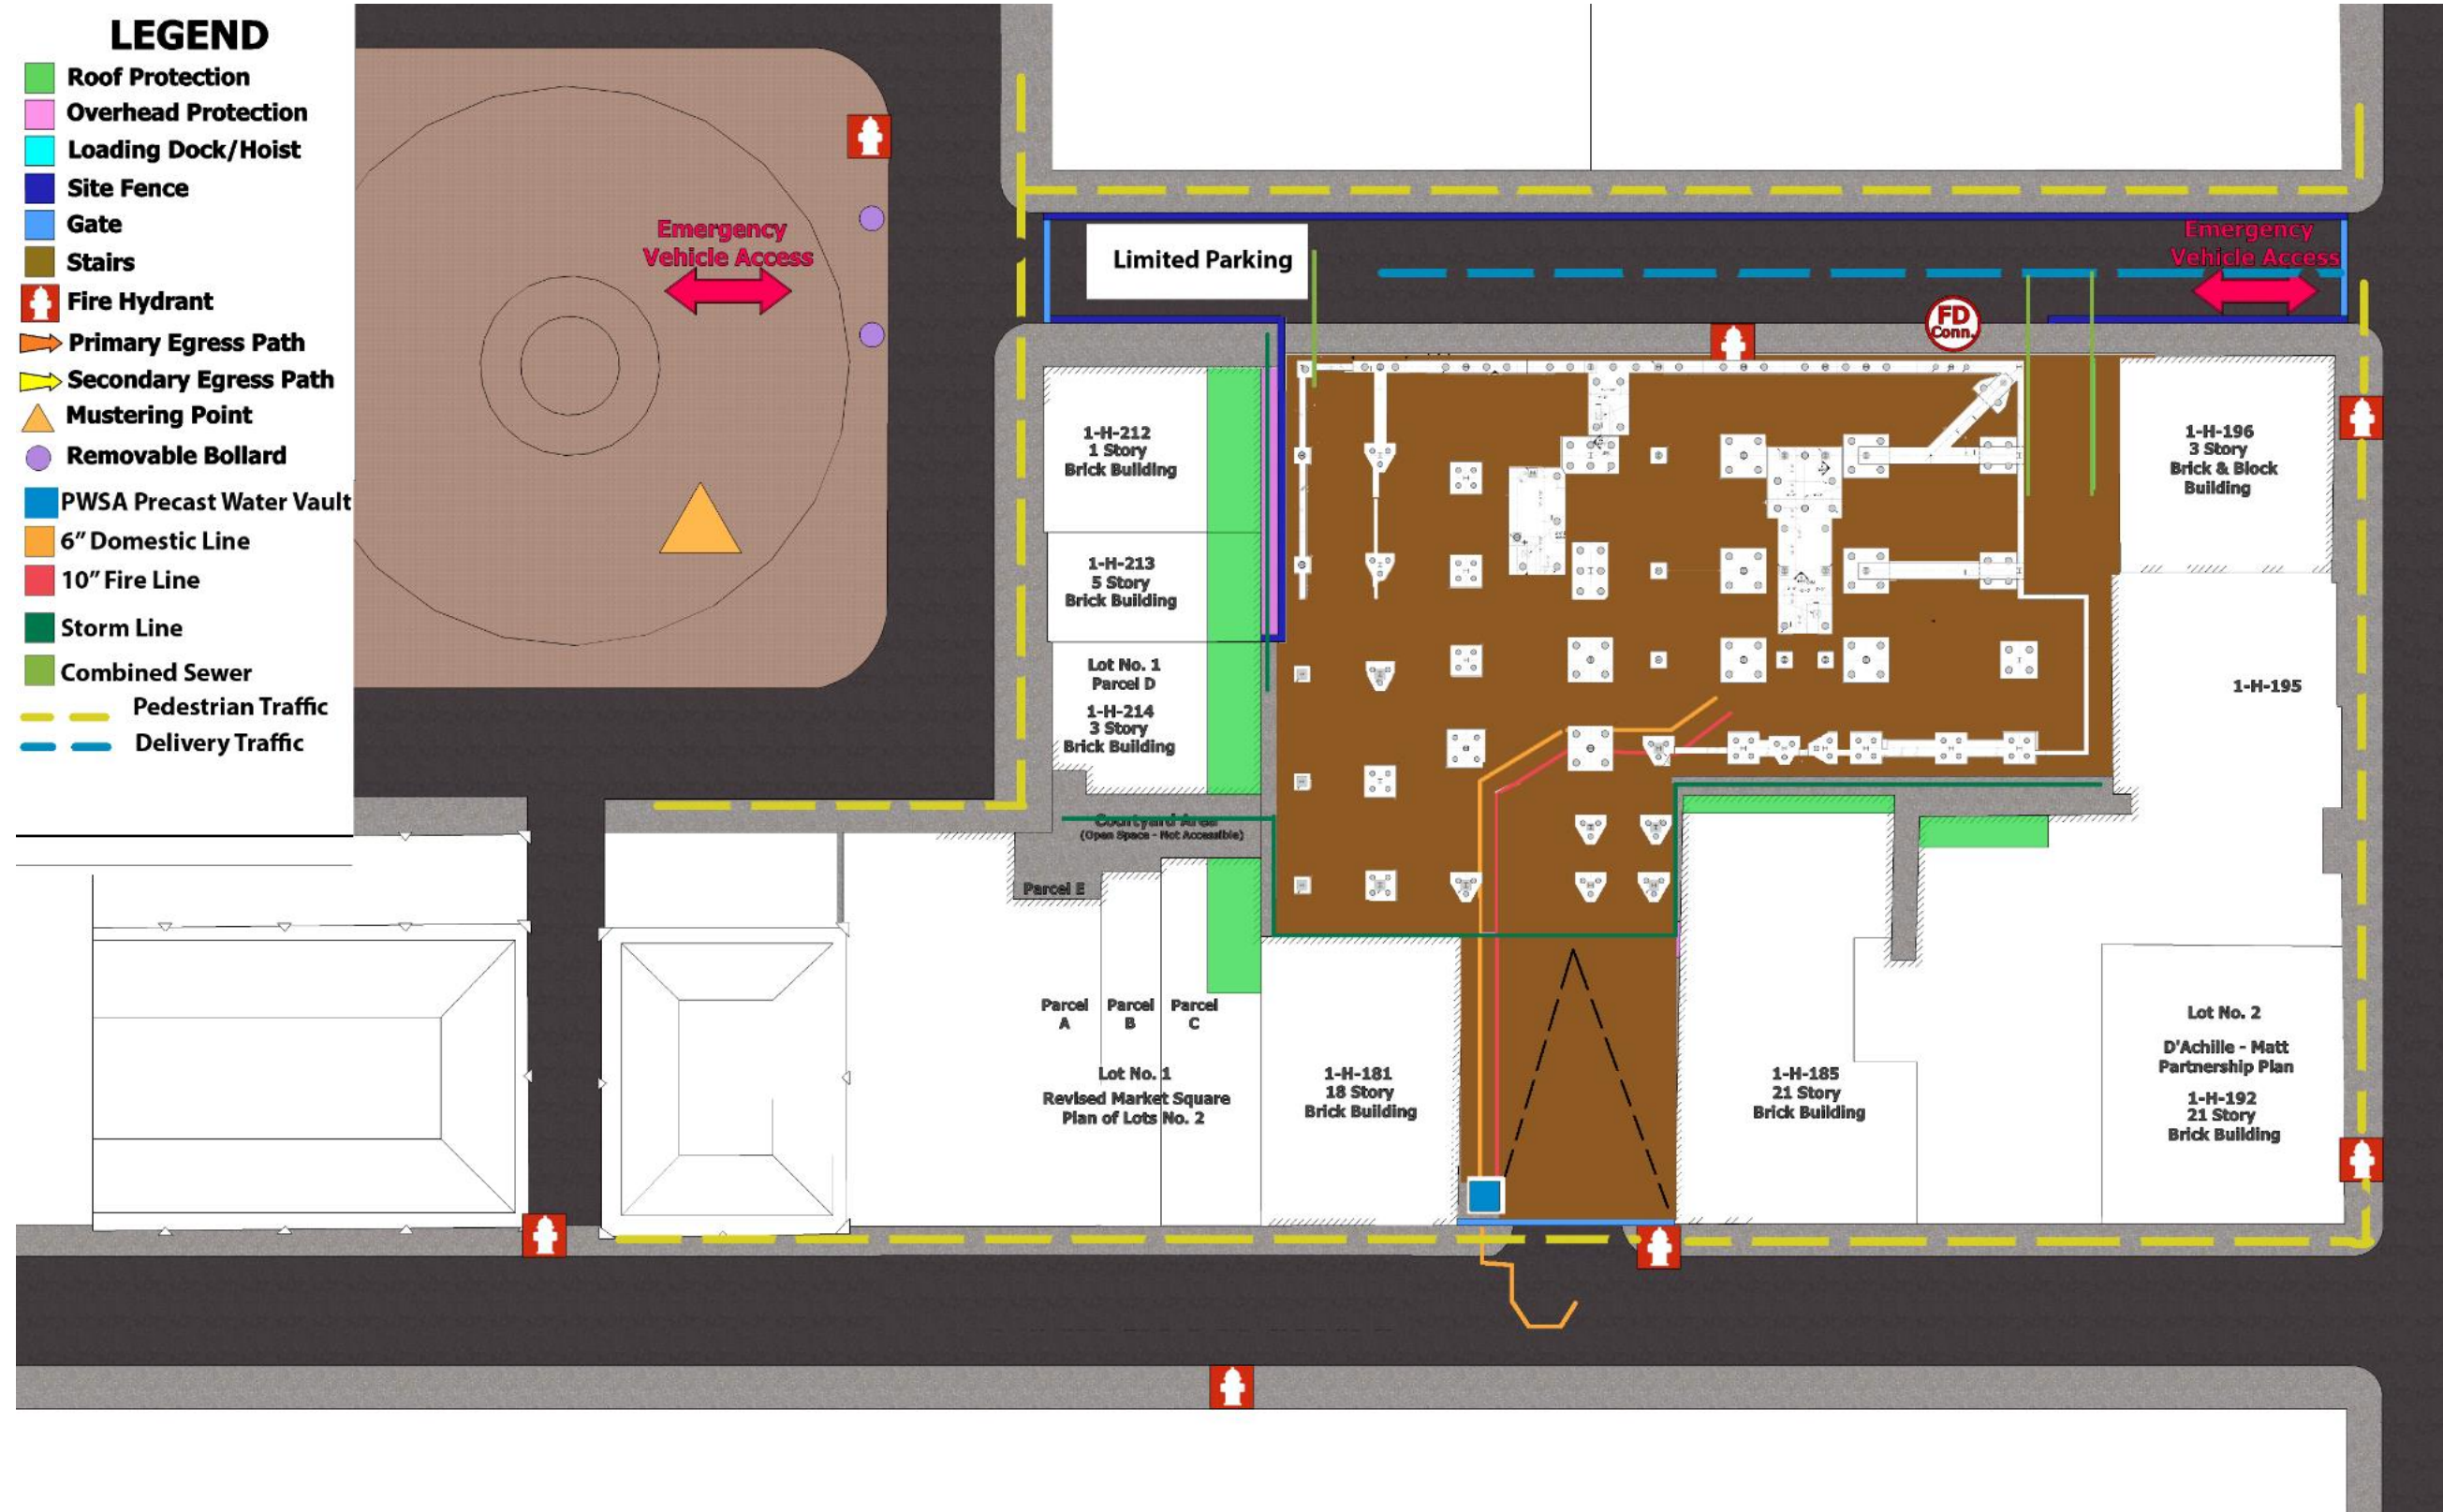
Pile Cap and Grade Beam Site Logistics Plan
